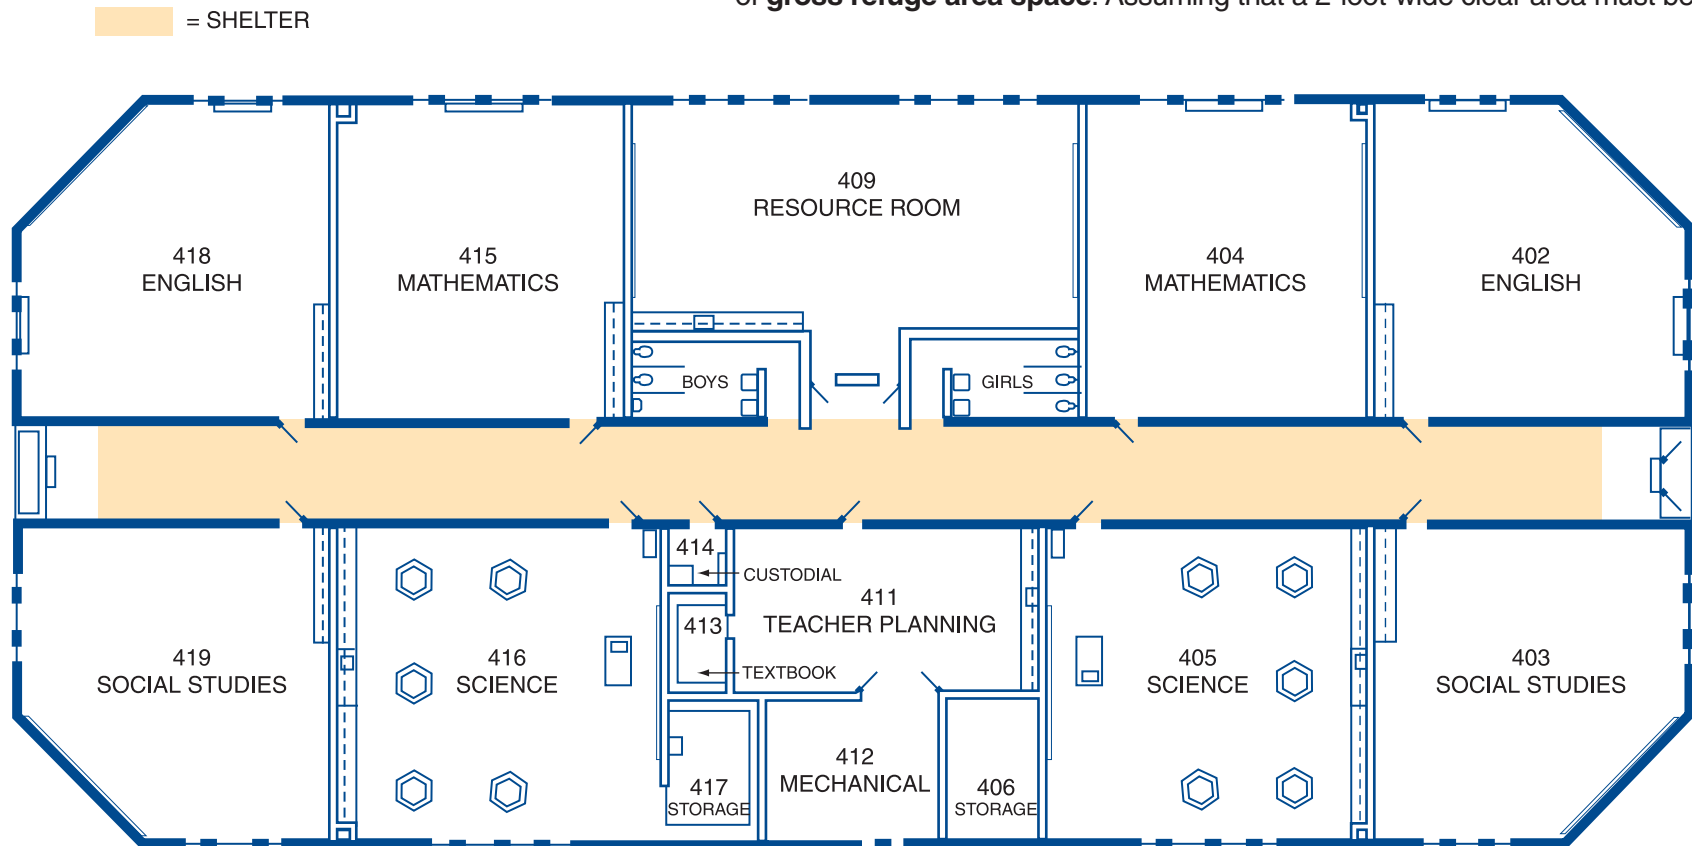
Best available refuge areas in the example school – corridors in Buildings 200, 400, 600, and 800.
